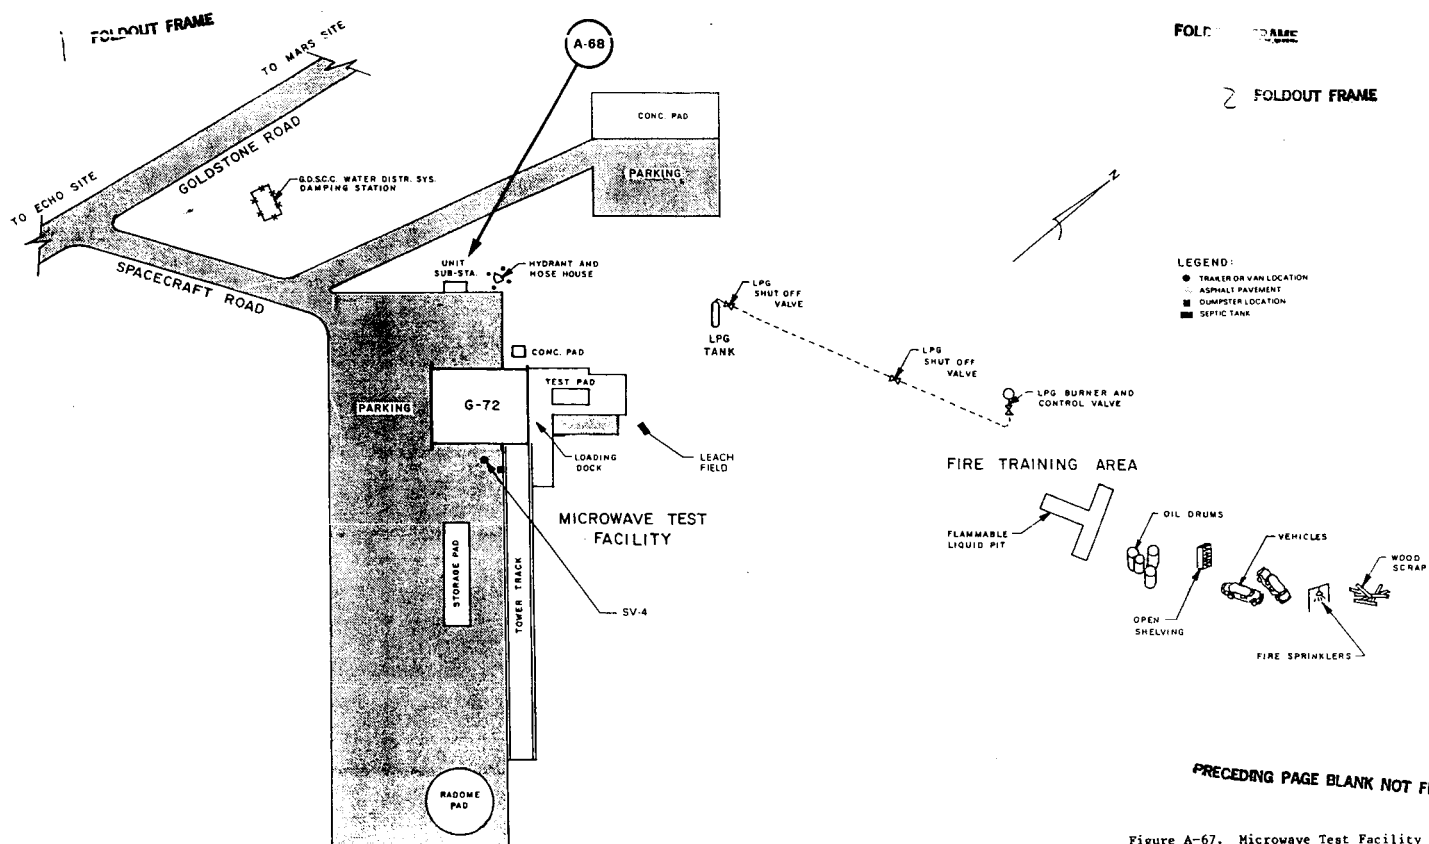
Microwave Test Facility and Fire Training Area: Plot Plan
